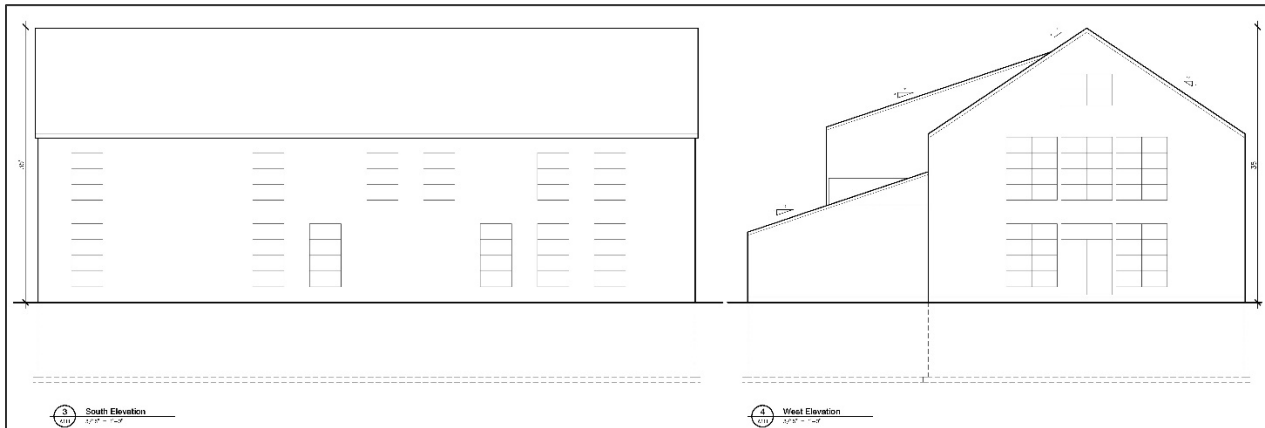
Corporate Event Venue South and West Elevations (source: Shoalts & Zaback Architects)
